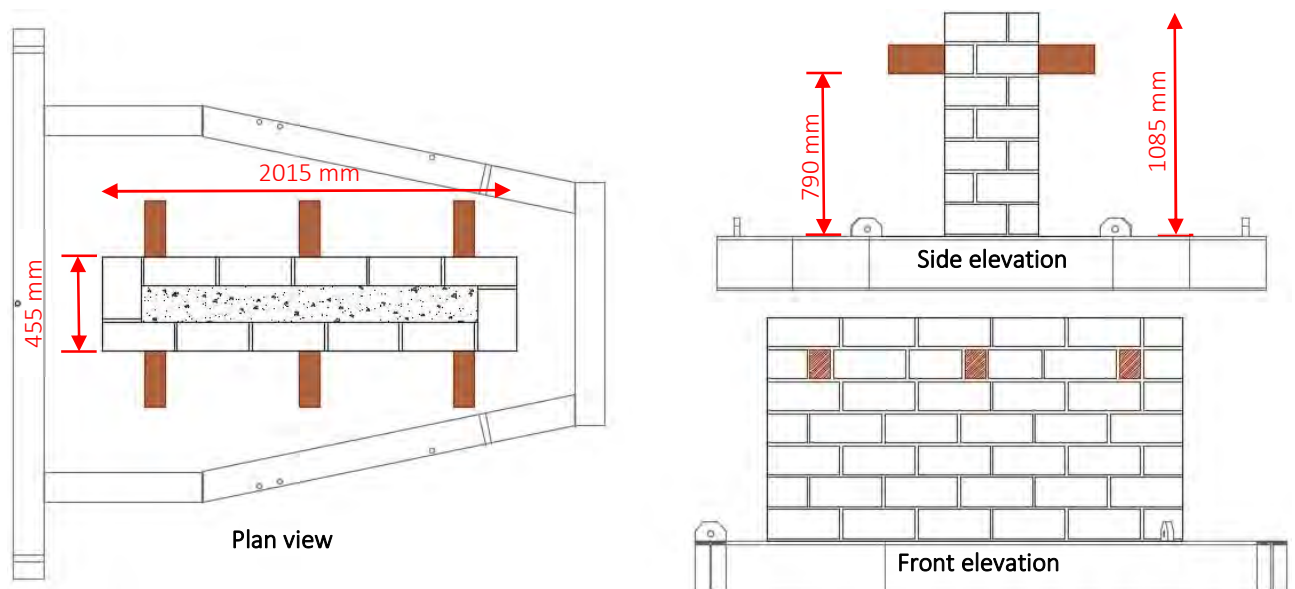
Rectangular wall design: plan view, side elevation and front elevation
